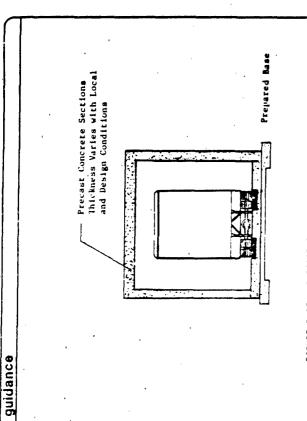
PRECAST CONCRETE RECTANGULAR SECTION.
